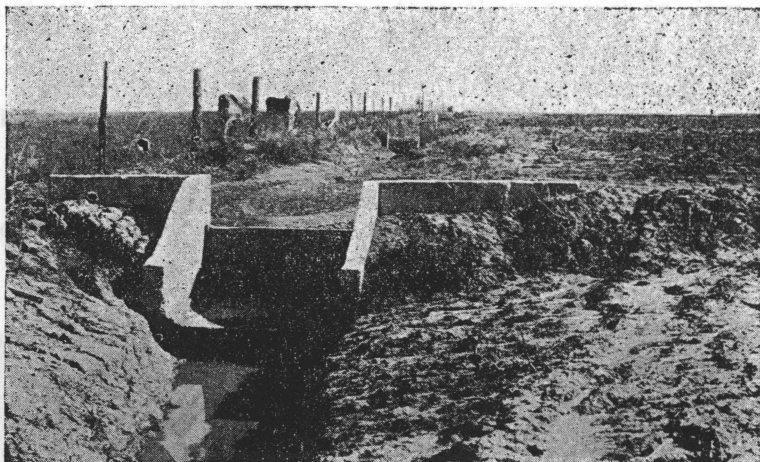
Concrete spillway dam in a terrace outlet ditch at the end of a terrace.
